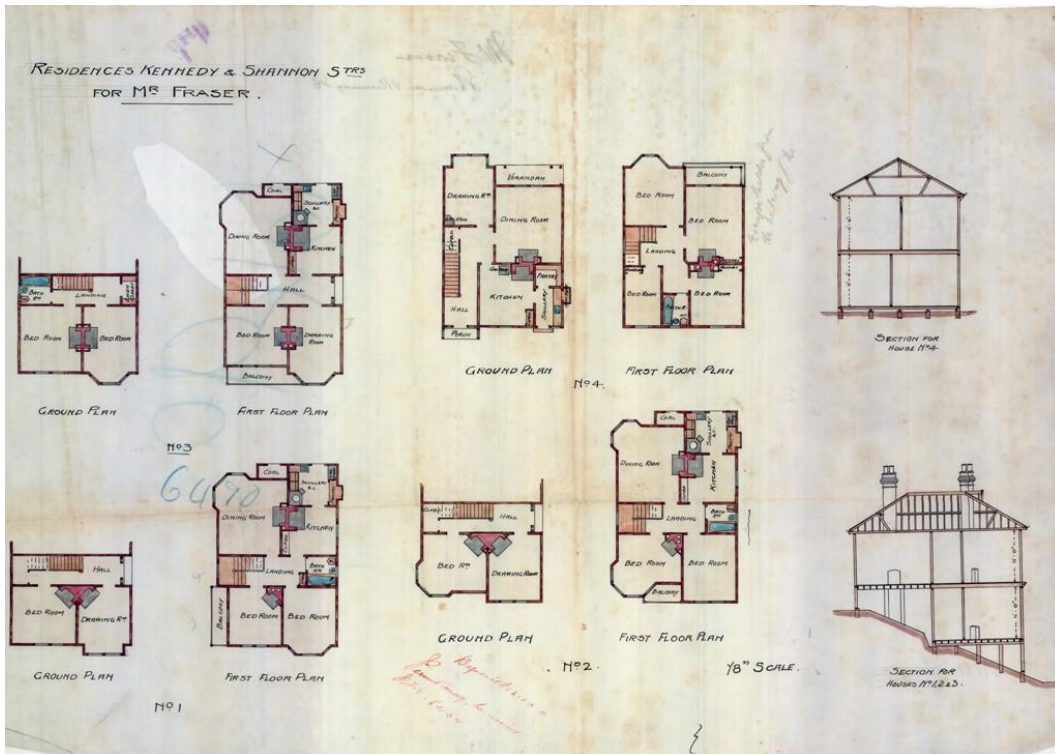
Image: The plans for 1, 3 Kennedy Street and 10, 12 Shannon Street. (6490; WCA)
